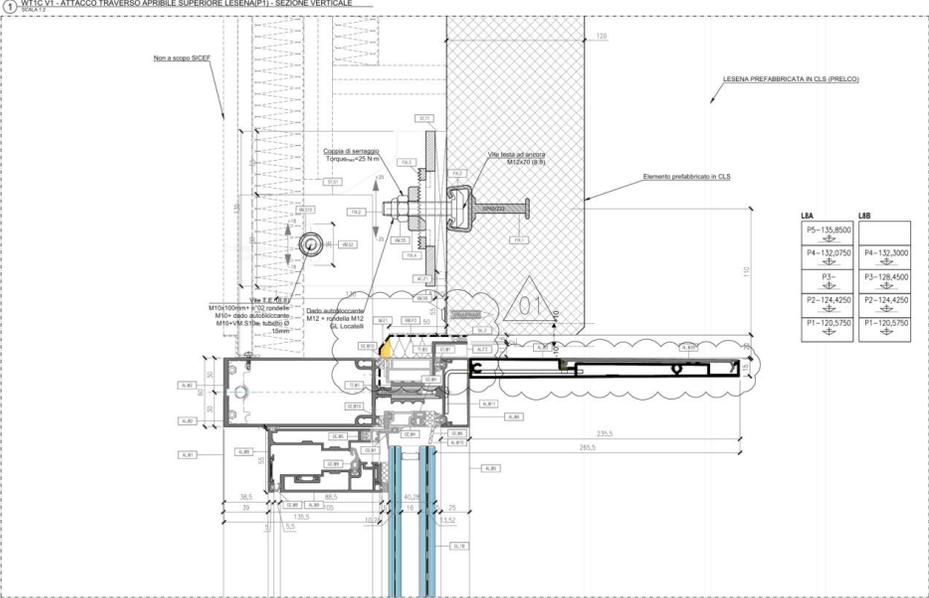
Standard Top Bracket Connection Detail developed with AutoCAD: Author
